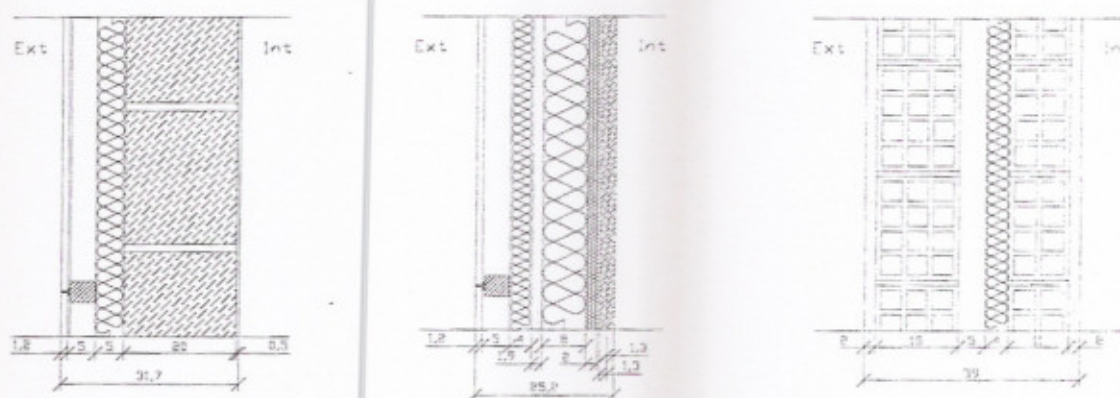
(a) Mixed-weight double leaf wall PMD2.1/15 – wood/cement board, air gap, cork insulation, air gap;
